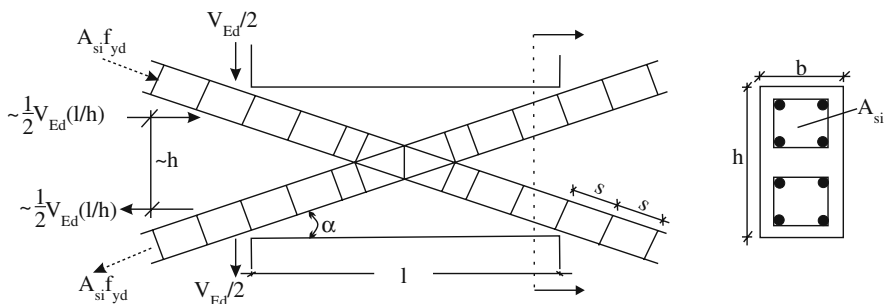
Diagonally reinforced coupling beam (CEN 2004a)
